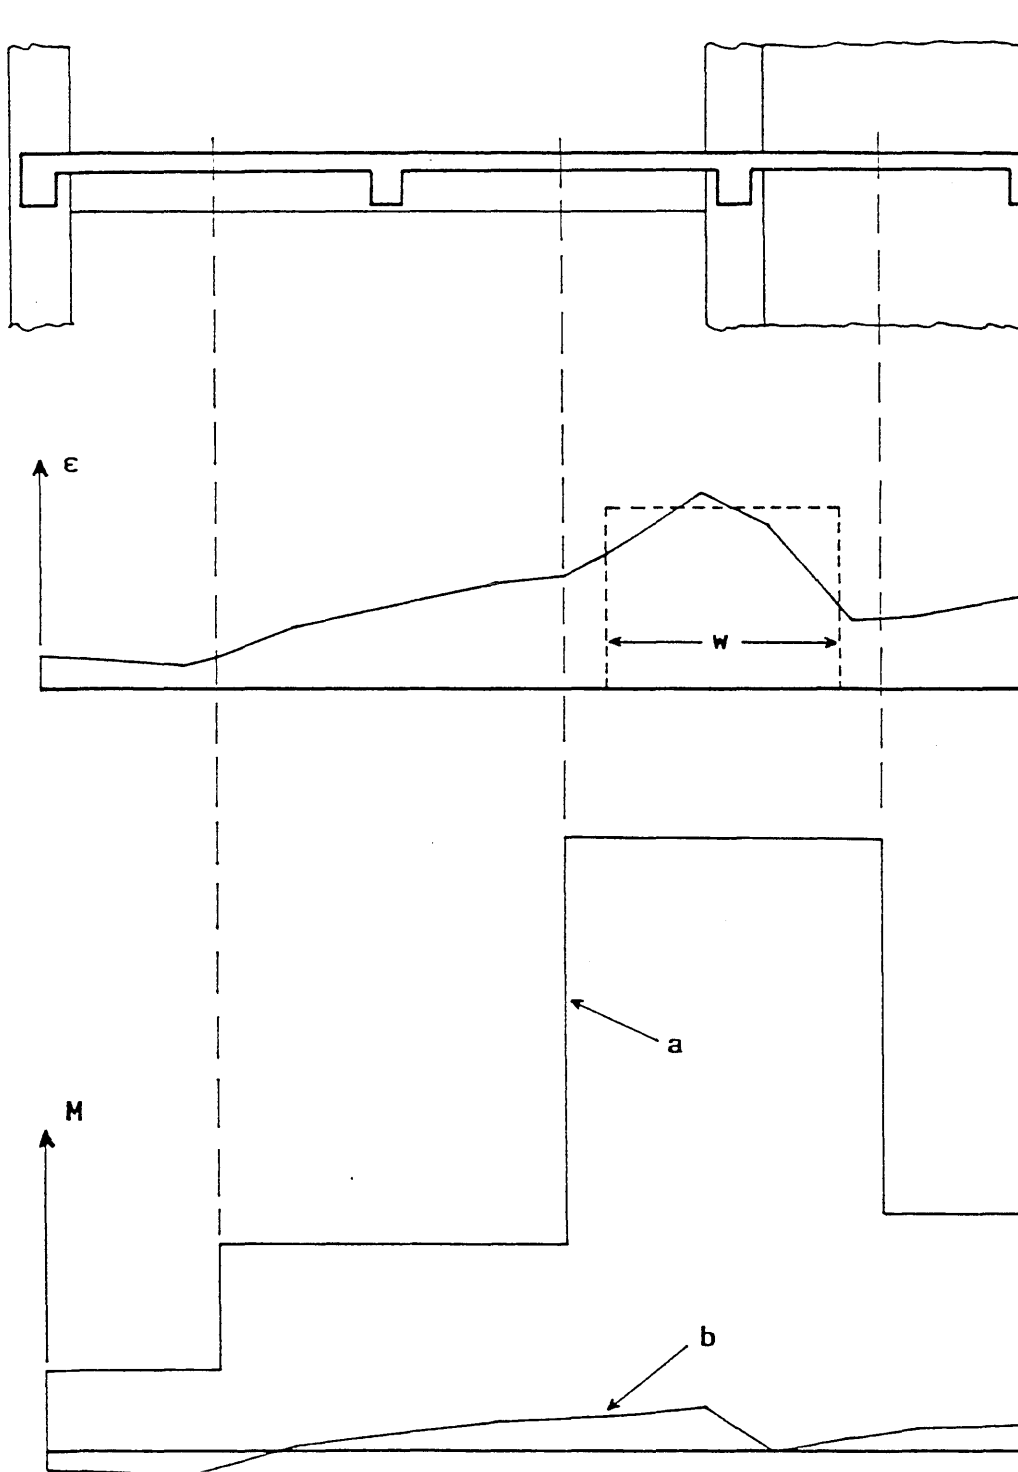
Bending moments for beams (a) and slab (b) and slab strains at the level of top reinforcement along a longitudinal section. The beam moments have been distributed on the beam influence widths.
